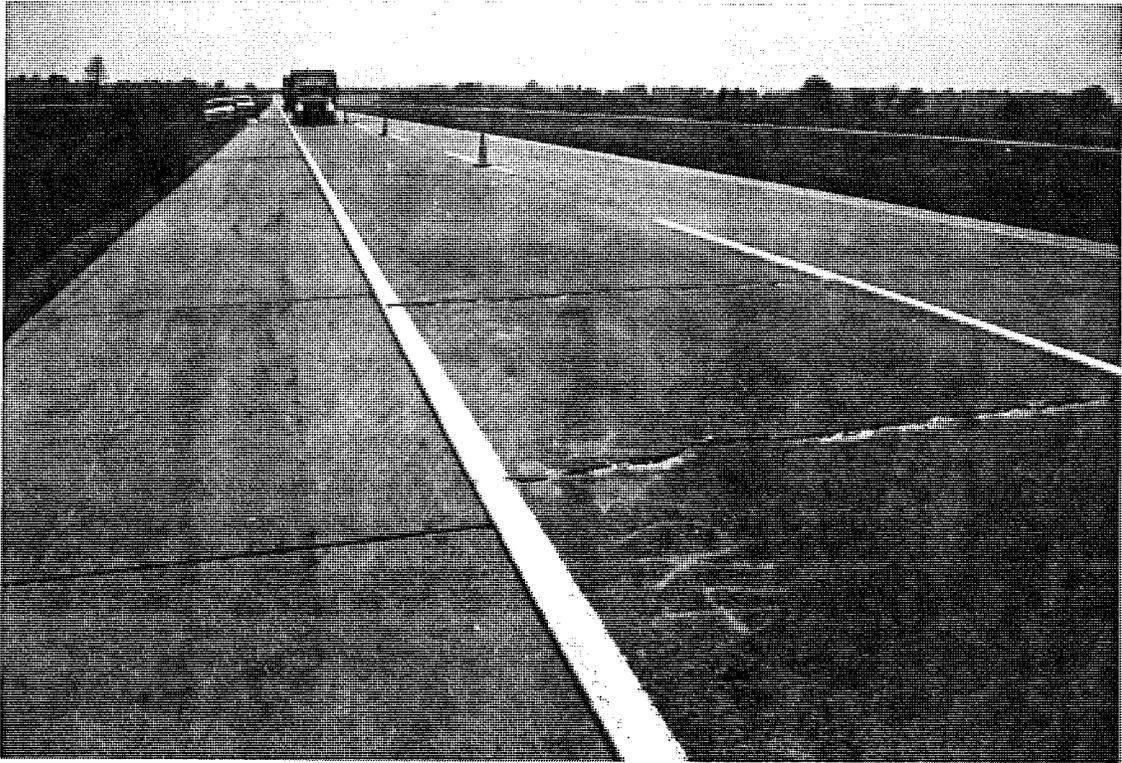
An overview of CSN# 77024-20821A (Section A), EB, showing severely spalled and faulted cracks at third point shoulder joints. The joint spacing in the driving lanes is 41 ft.
